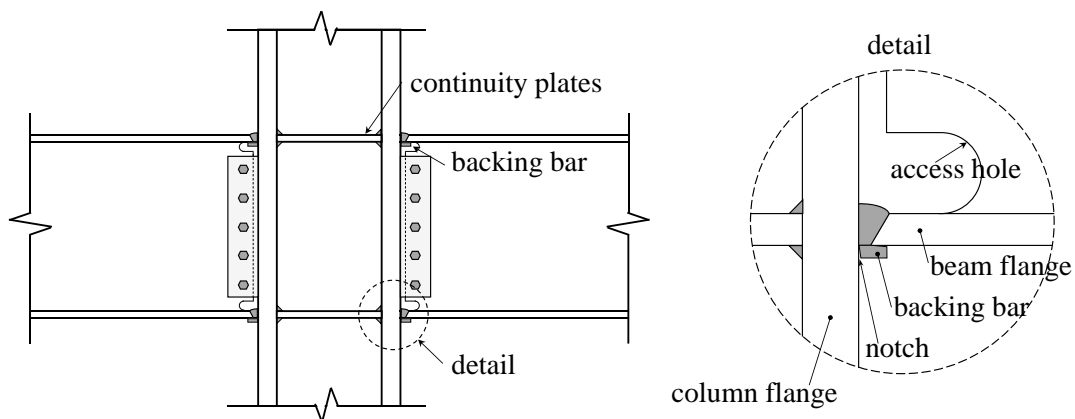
Typical pre-Northridge fully restrained welded unreinforced flange-bolted web (WUF-B) beam-to-column connection detailing.
